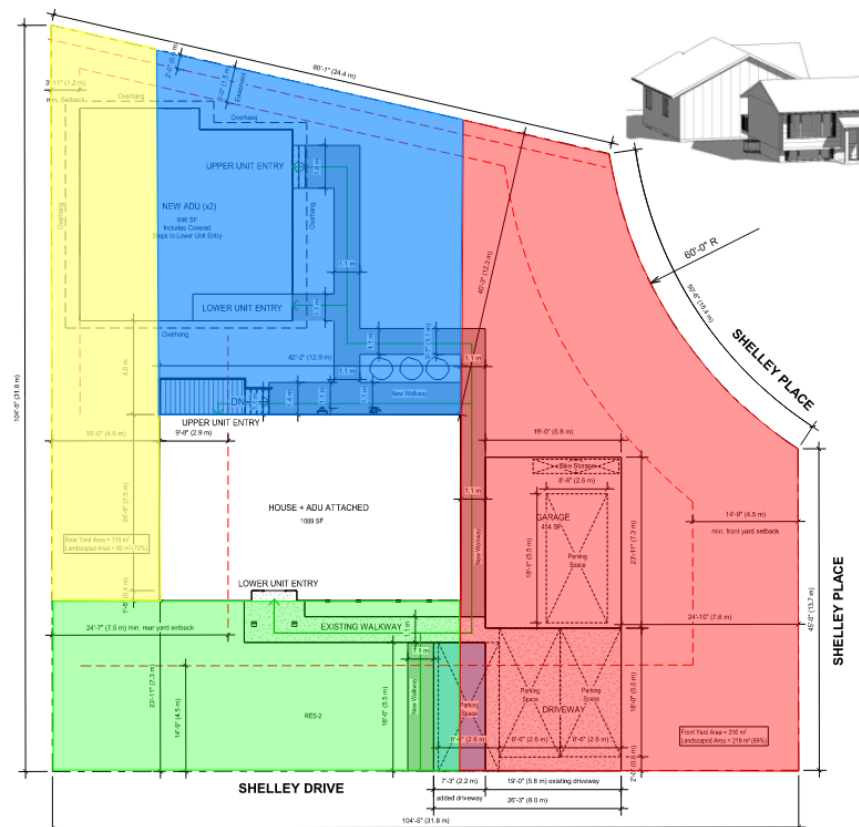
Site Plan with yards identified (front yard in red, exterior side yard in green, rear yard in yellow, and interior side yard in blue).
